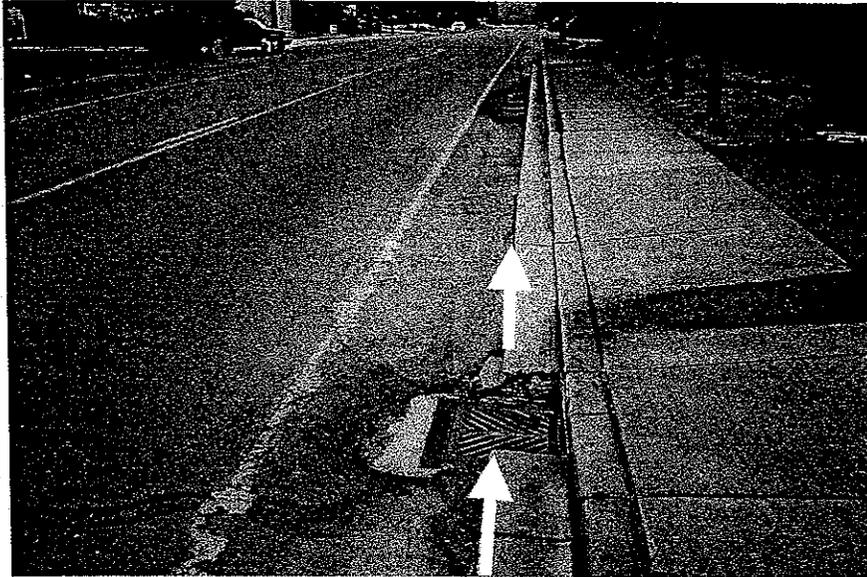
Looking south from culvert inlet to next catch basin located in Sultan Basin Road.
